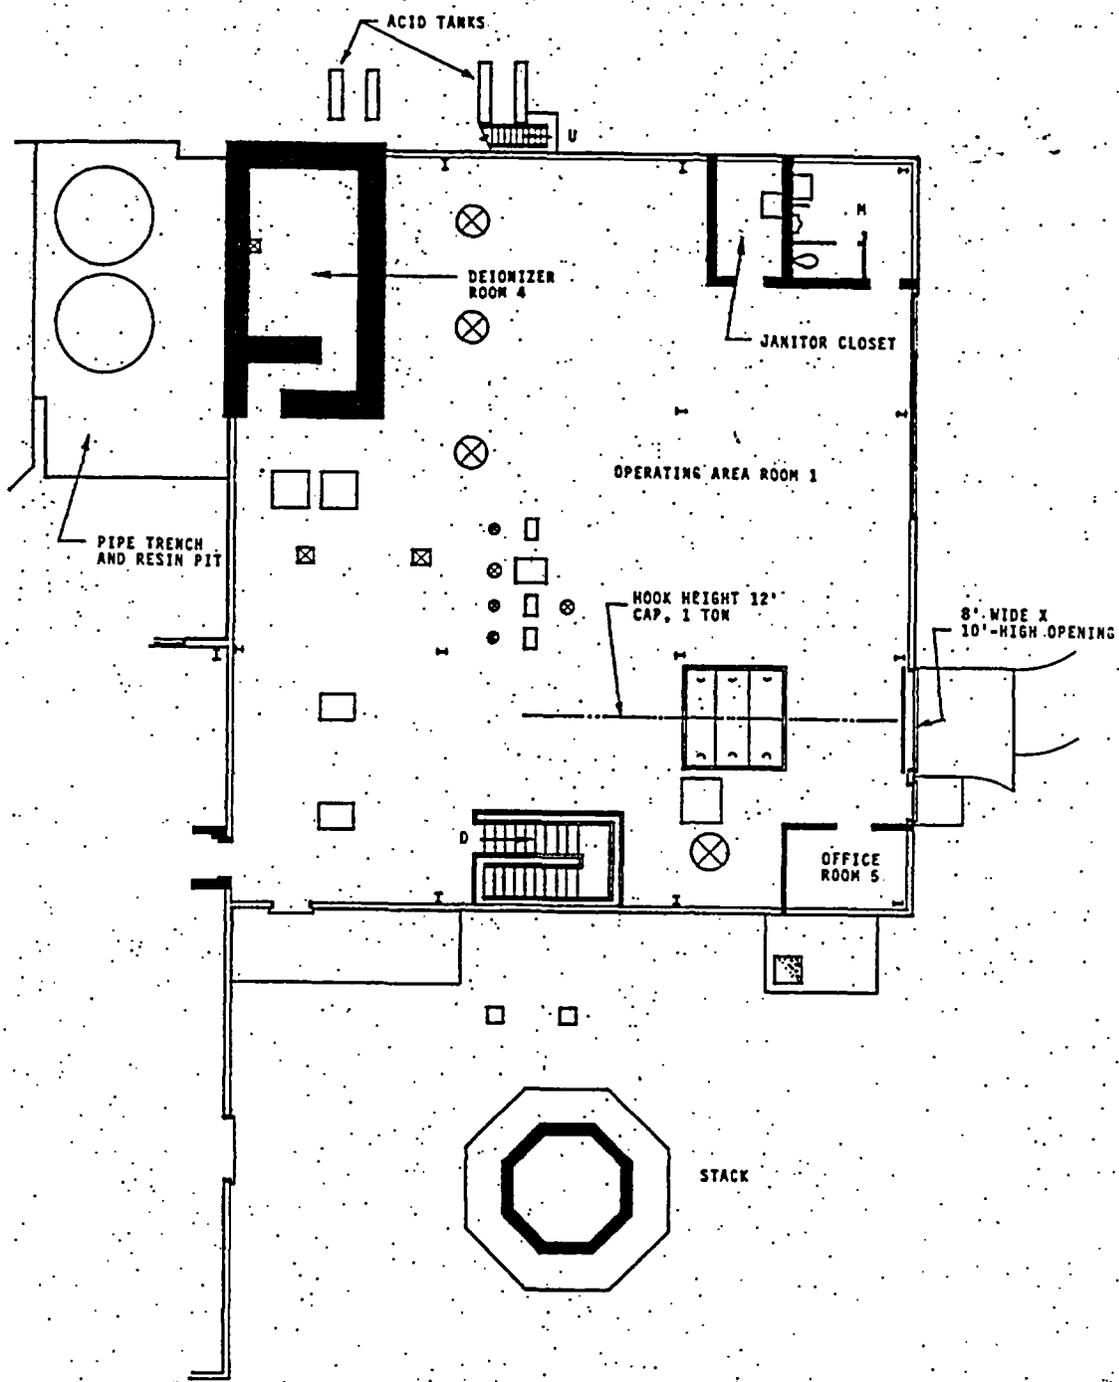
Plan View of Fan House (1132) (modified from NASA 1980b)
